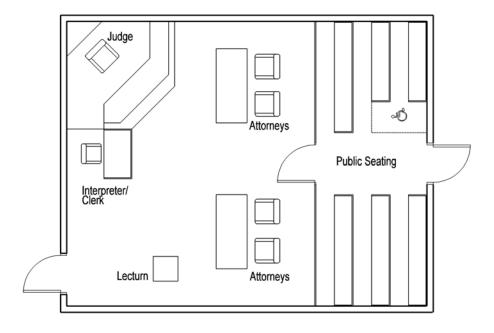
Option 4: EOIR Courtroom Plan with a Corner Bench
